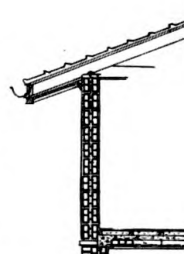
Pitch roof with box cornice, the wall being hollow tile stucco coated.
